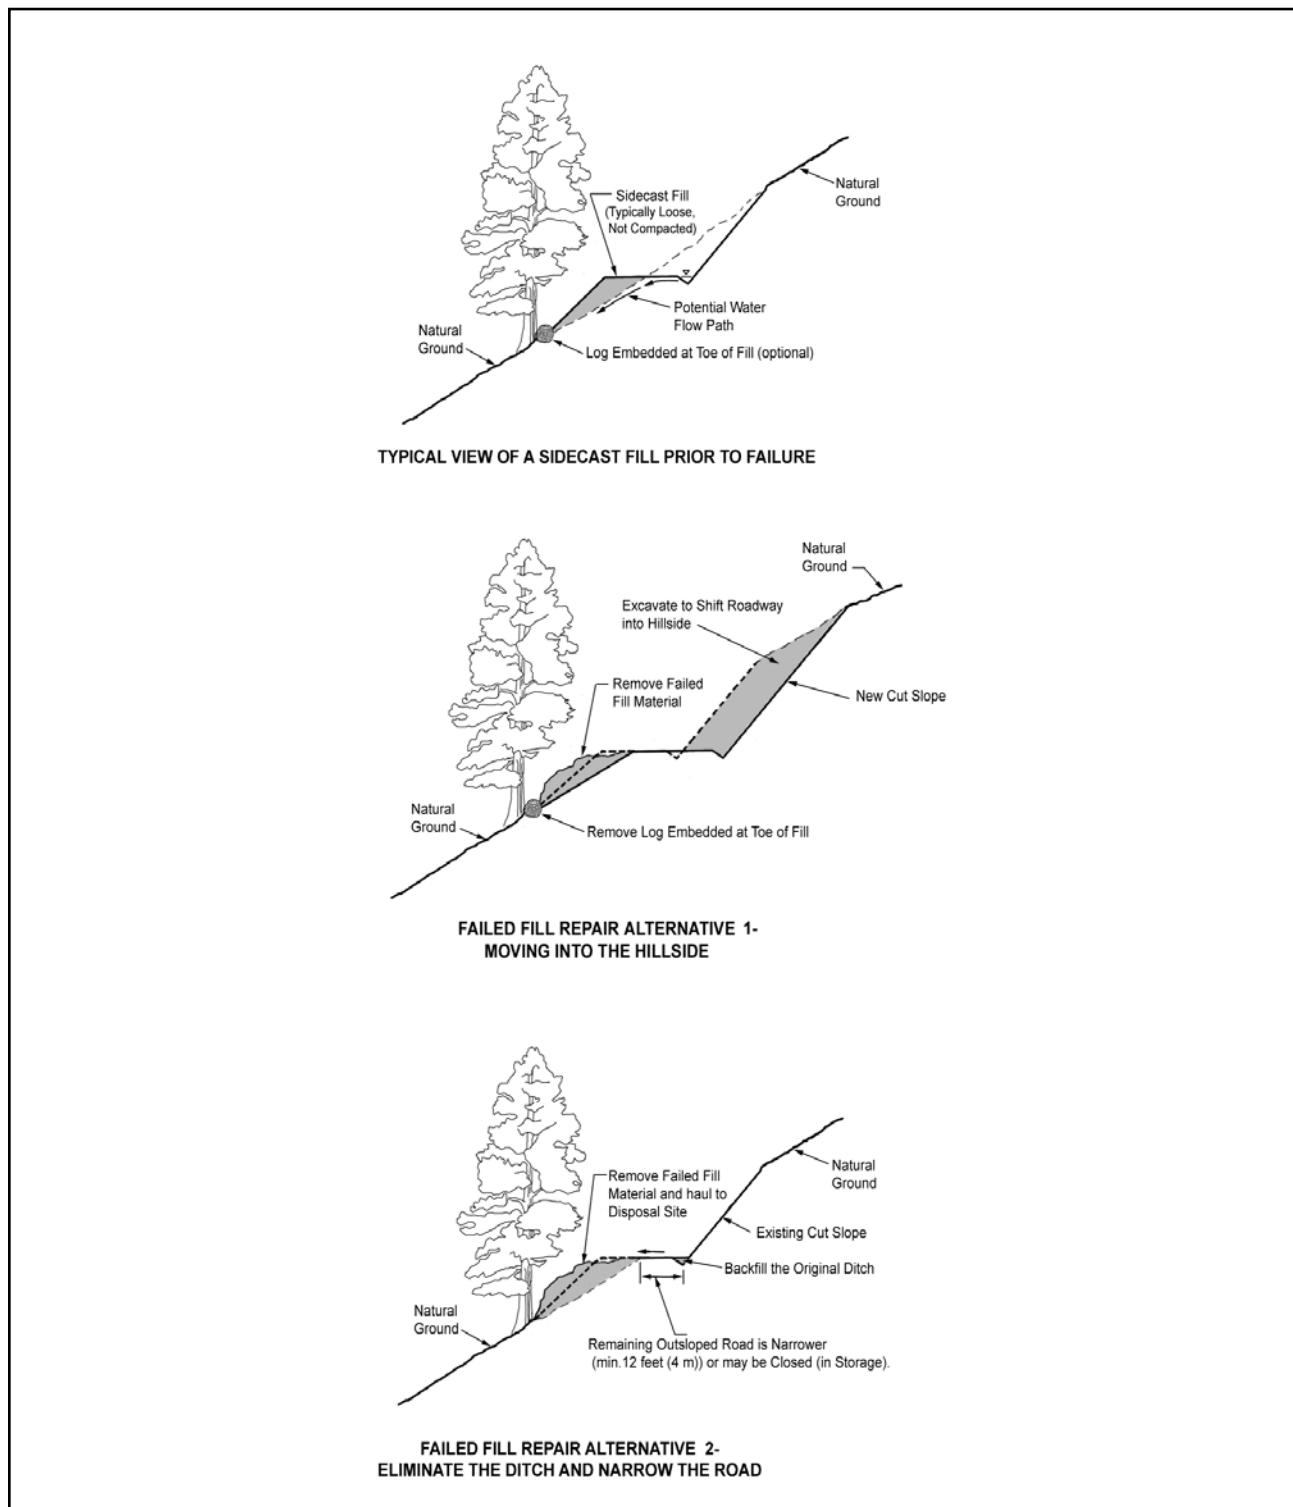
A fill failure repaired by pulling back or removing loose, sidecast shoulder and fill material and shifting into the hillside, or possibly narrowing the road.
